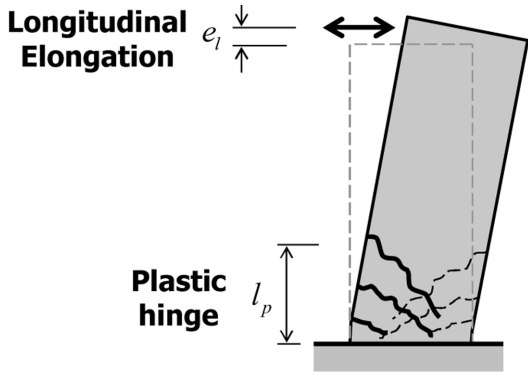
Longitudinal elongation of reinforced concrete members subjected to cyclic loading
